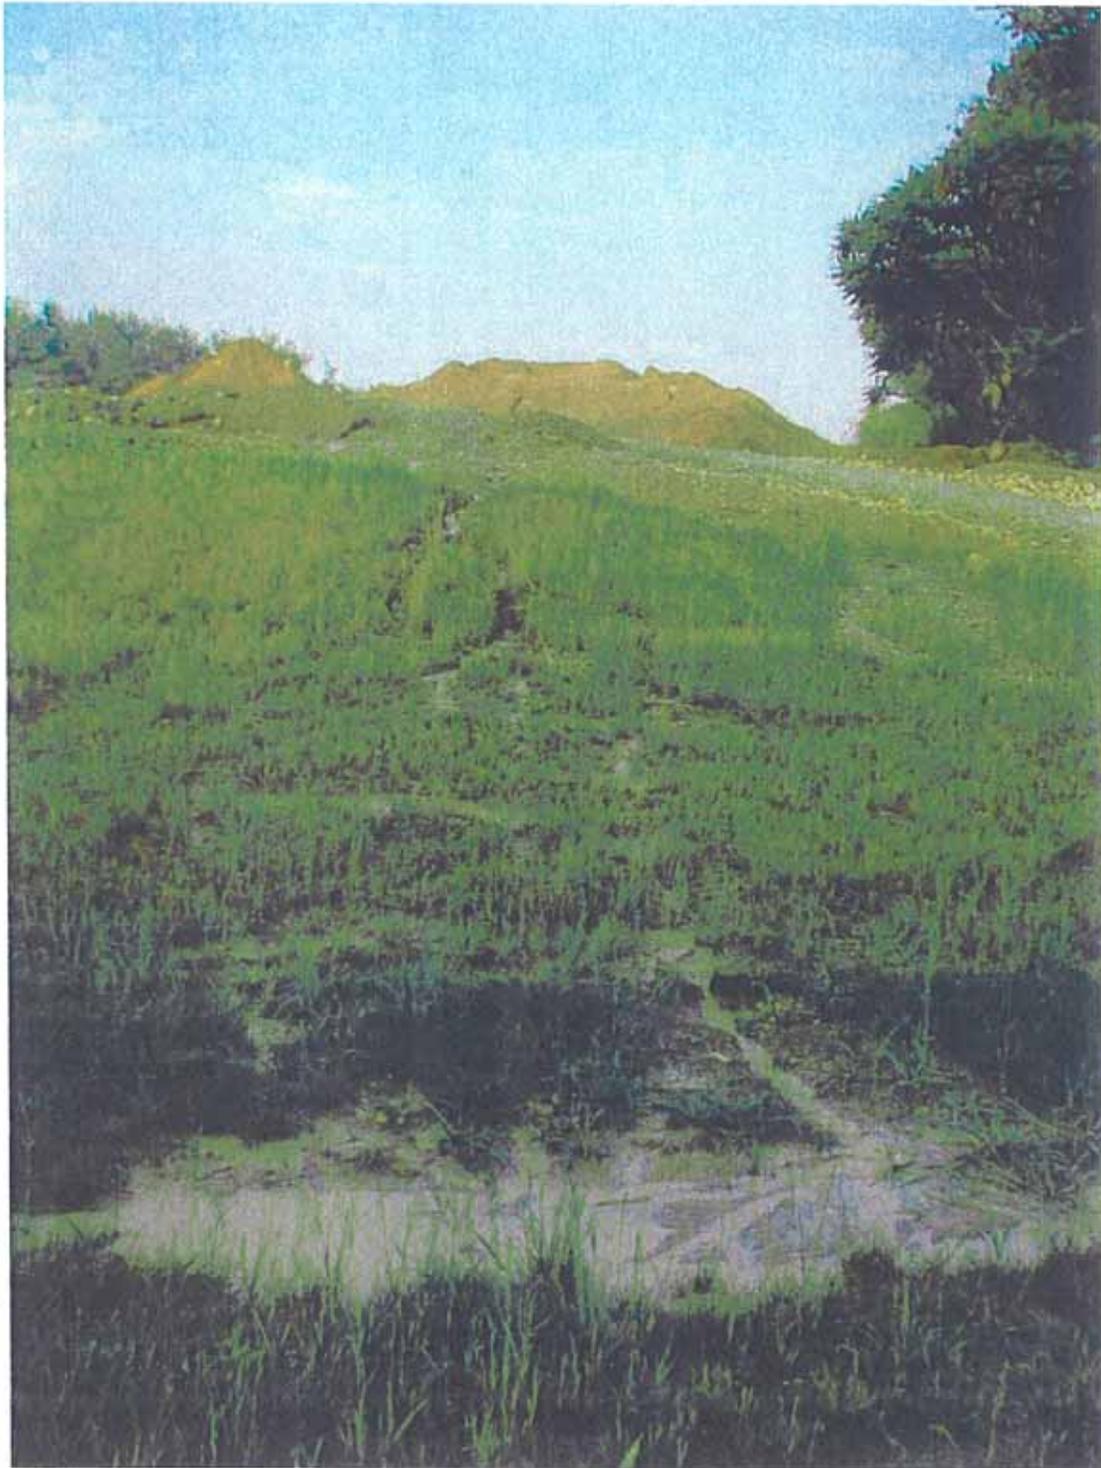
Photo C. North of Photo B looking up at the spoils area west of the Turnpike. Runoff containing high sediment levels is washing down and eroding the slope into drains and onto the road.
